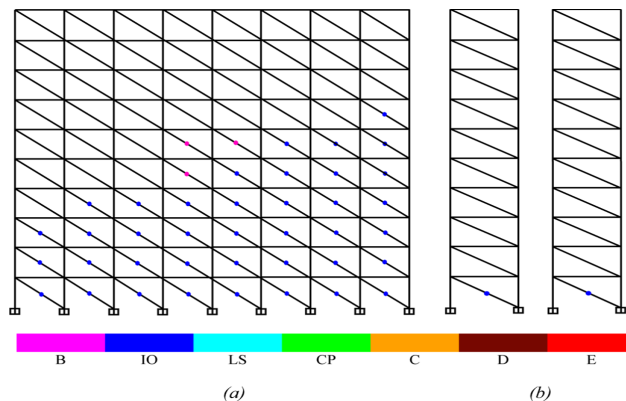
Yield pattern under gravity load for ten storey uniformly infilled SMRF building, when construction sequence is considered in analysis: (a) typical longitudinal frame; (b) typical transverse frame
